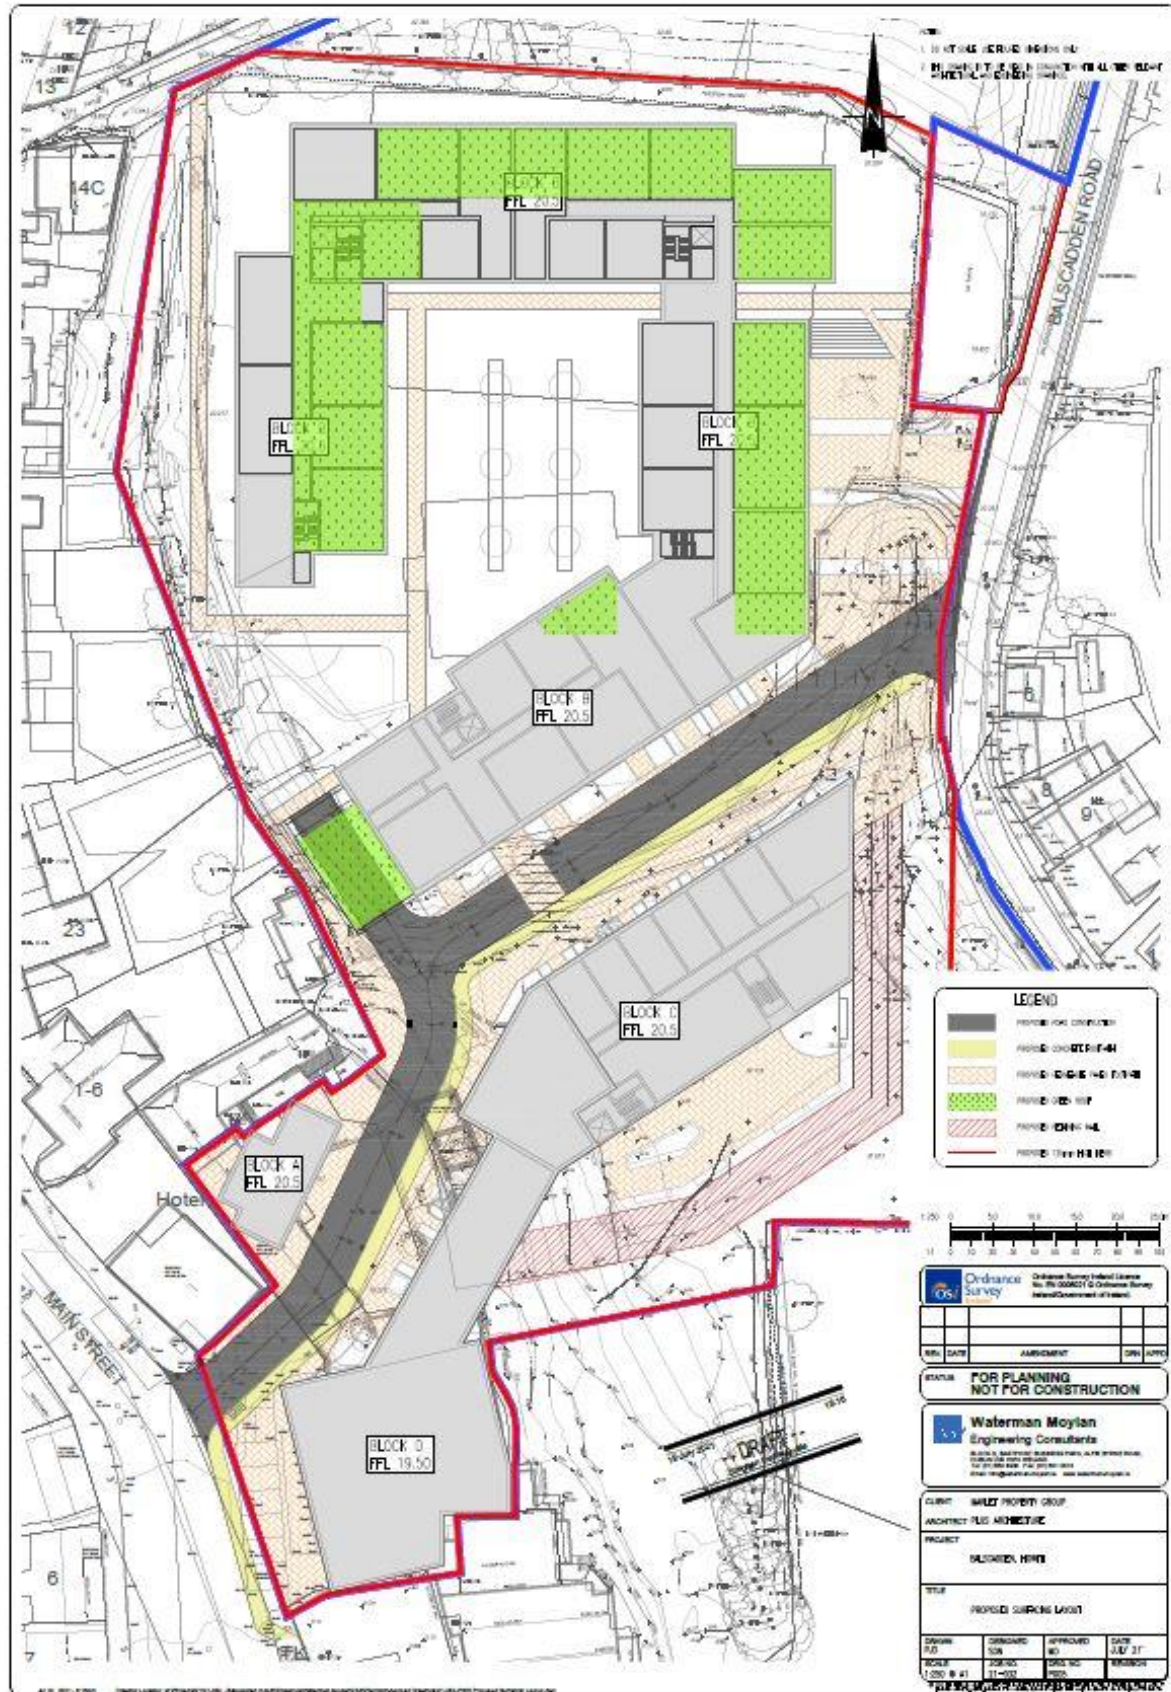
PROPOSED SURFACING LAYOUT (WATERMAN MOYLAN, 2021).
